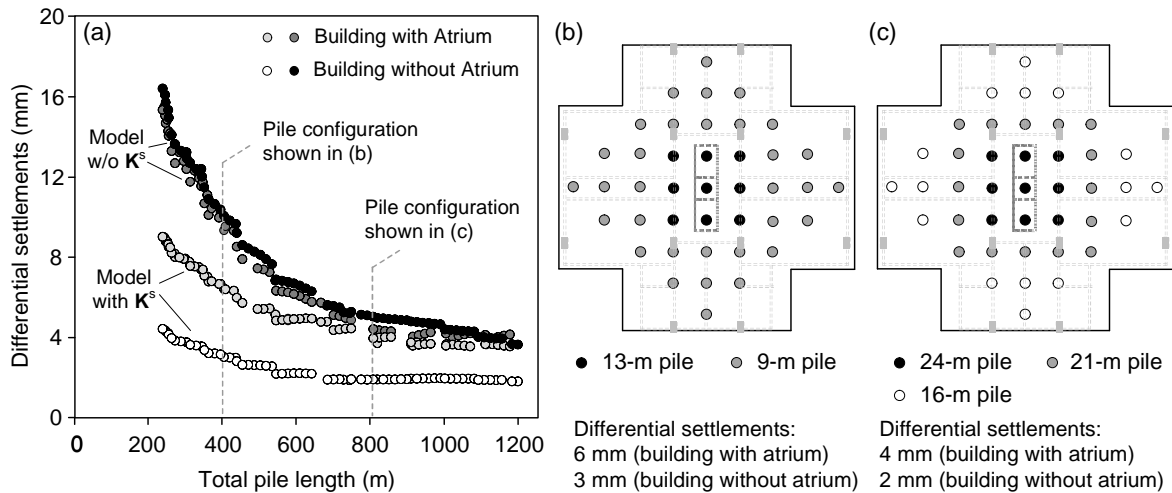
Pareto frontiers and optimized pile configurations for buildings with and without atrium floor
